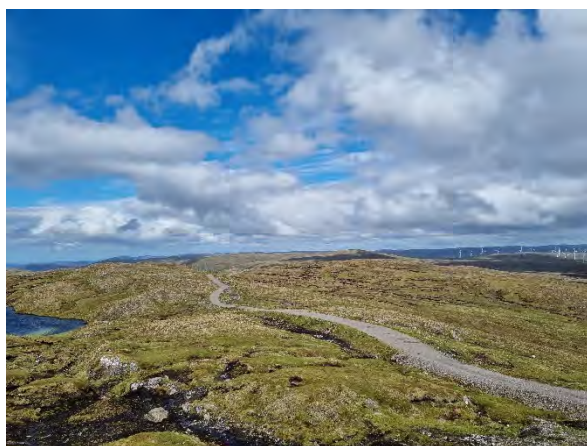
View from main access track into Stronelaig Windfarm, at point approximately 1.5 km north of Glendoe Dam, looking east across a more minor track towards the area Route Option D1 would travel from Dell substation south from towards Cloiche substation.
